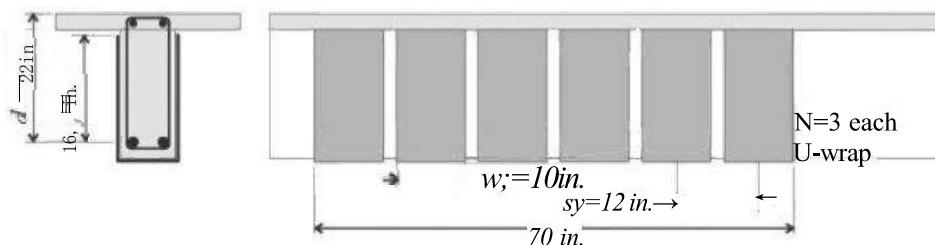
Configuration of the supplemental FRP shear reinforcement without FRP anchors. (Note: 1 in. = 25.4 mm.)
